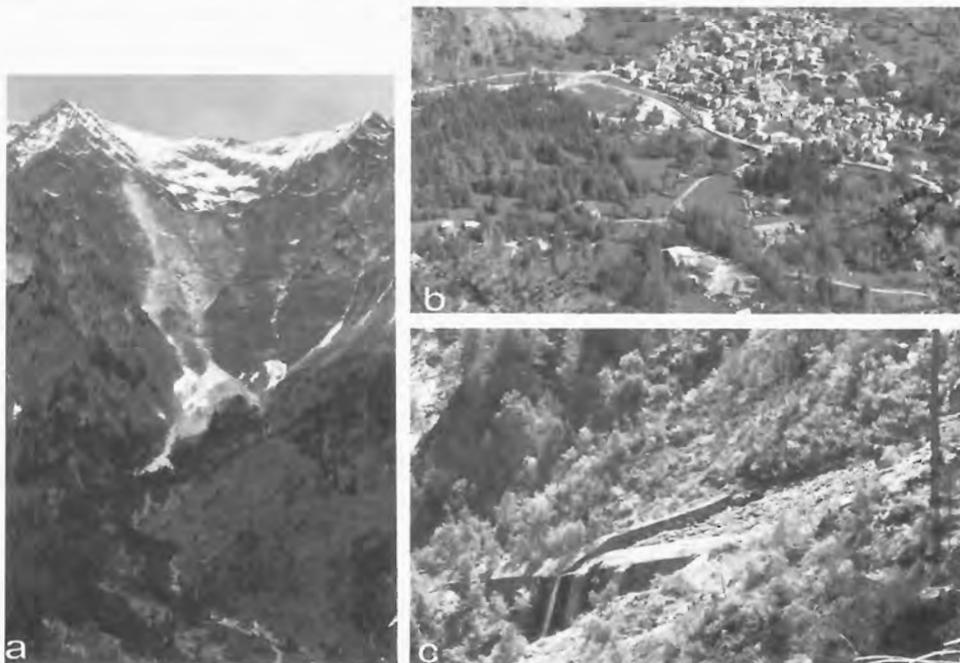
a) View of the scarp face of Cime di Pozzuoli and forest-covered rock avalanche lobe below (GSC 204166-X). b) The town of Antronapiana as seen from the unstable bedrock ledge below Alpe Corzelli (GSC 204166-Y). c) Concrete berm-retaining wall and surface drainage ditch at the toe of the incipient bedrock failure at Alpe Corzelli (GSC 204166-Z).
